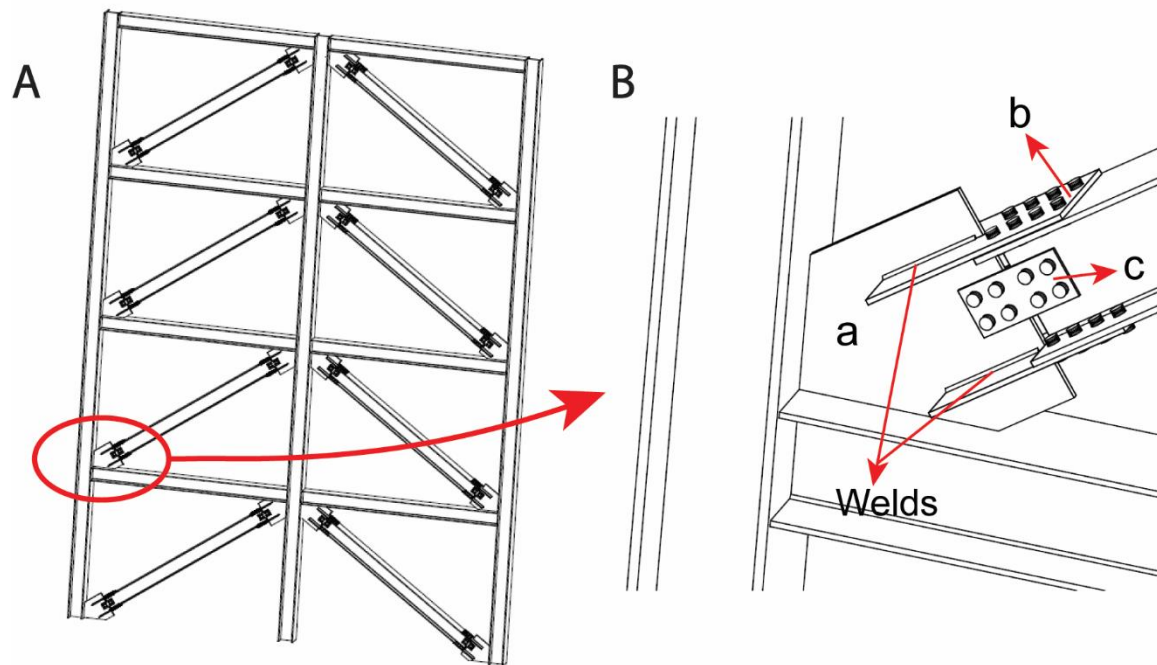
Schematic of CCBF with I-shape braces and flange plate brace connection: a) gusset plate, b) flange lap plate (FLP), c) web lap plate (WLP)
